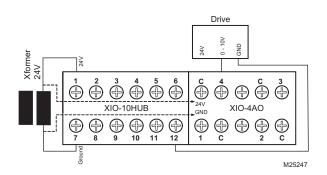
XIO-4AO Connection Example With XIO-10HUB.
